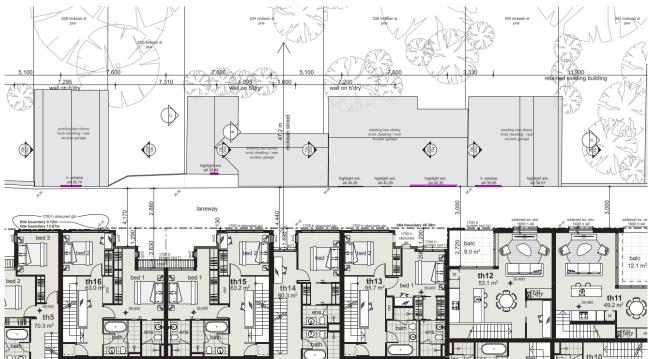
First floor habitable room windows associated with double-storey outbuildings at rear of dwellings fronting McKean St (highlighted in purple)
